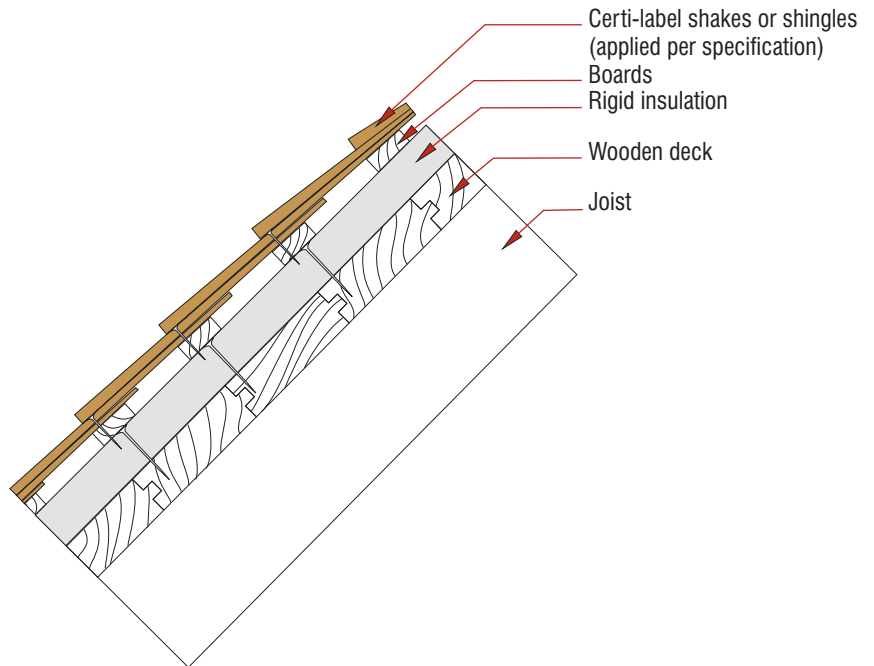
Specialty Roof Deck-Strapping Over Insulation
